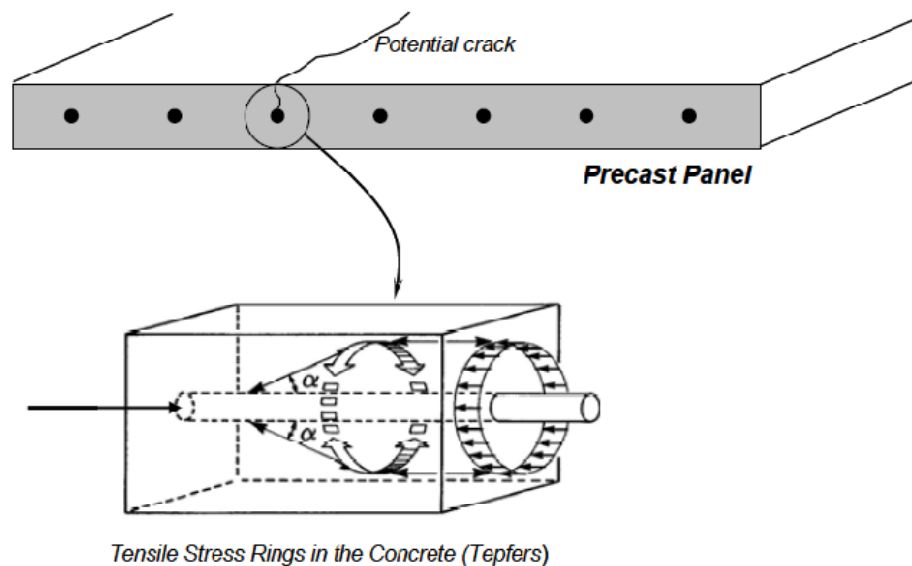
Mechanism of Longitudinal Cracking along Prestressing Strands Due to Circumferential Tension around Strands
